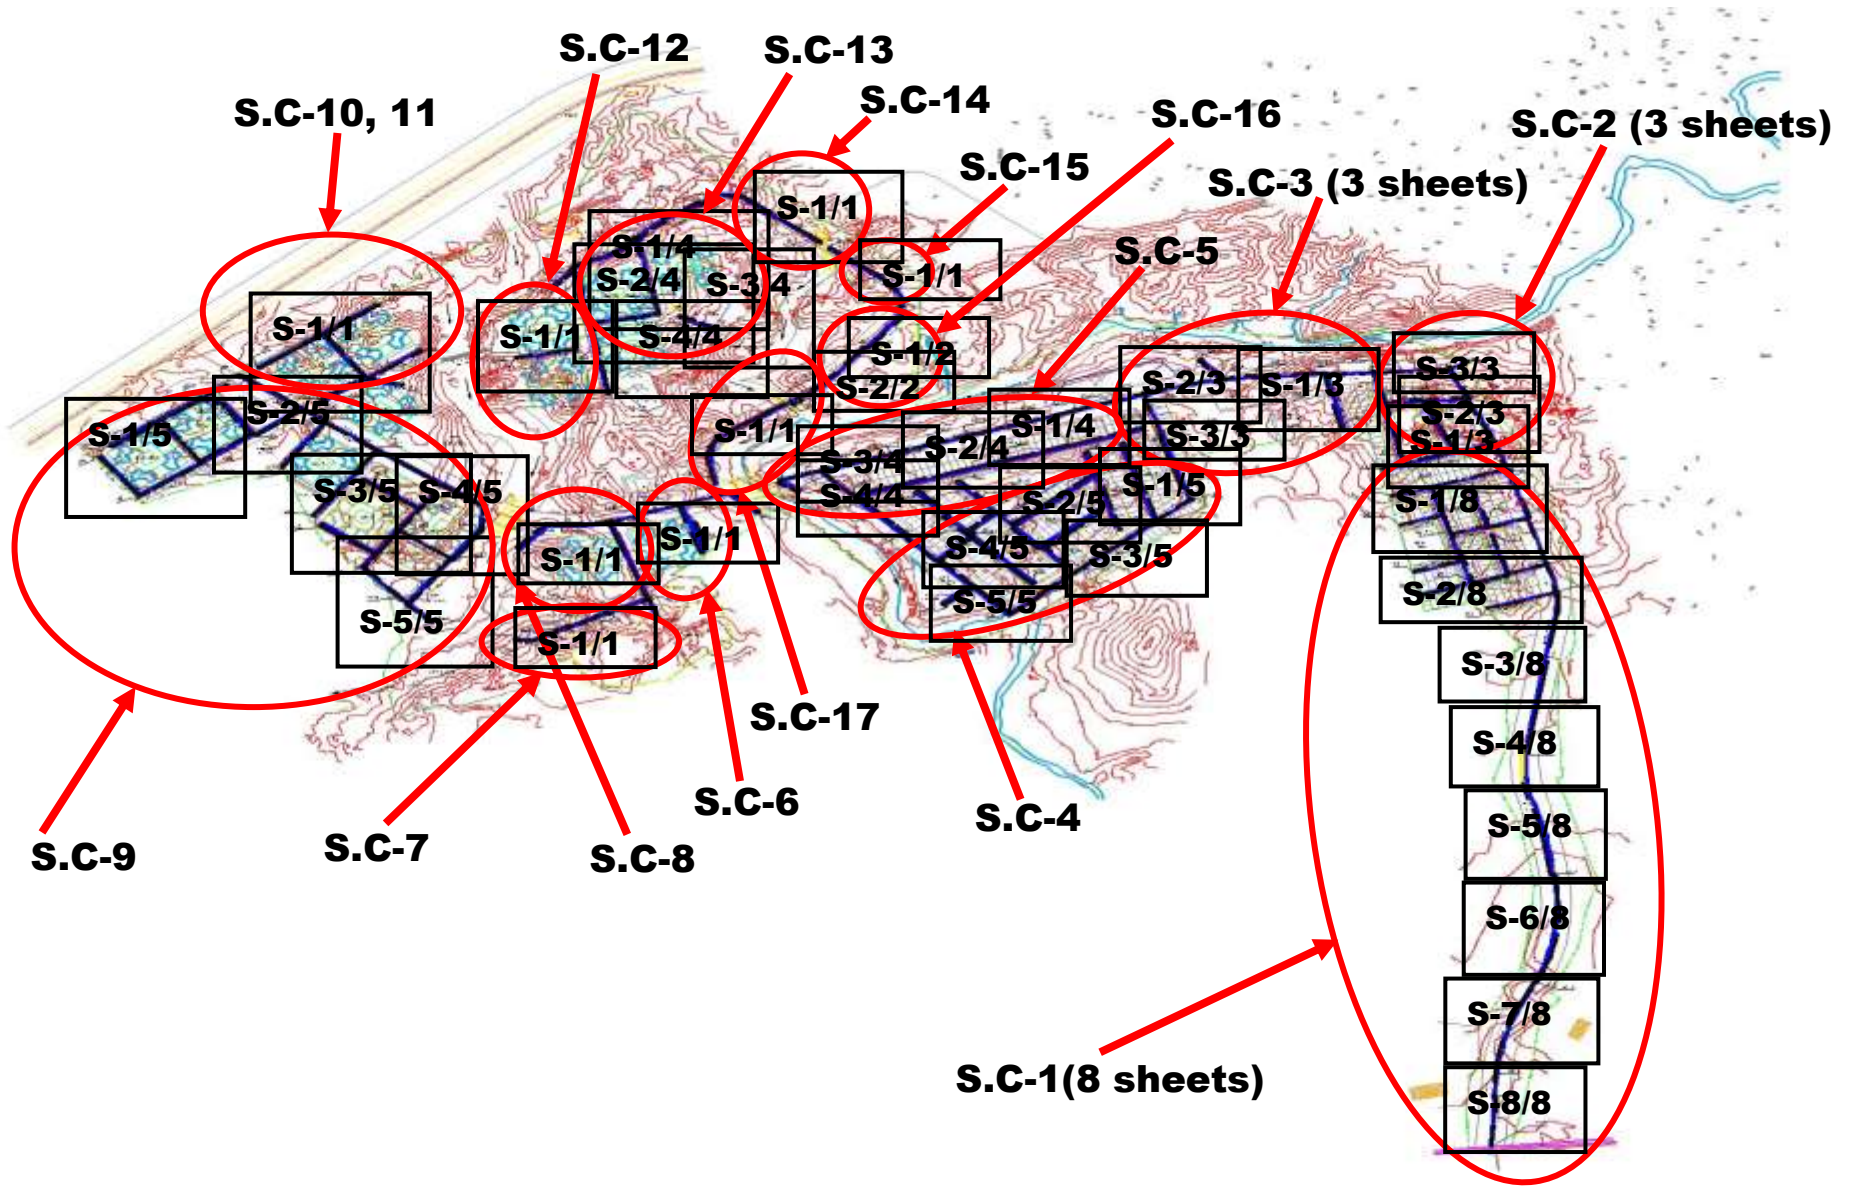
Storm drainage layout plan of entire residential colony showing 17 sub-catchments & legened for detail drawings
